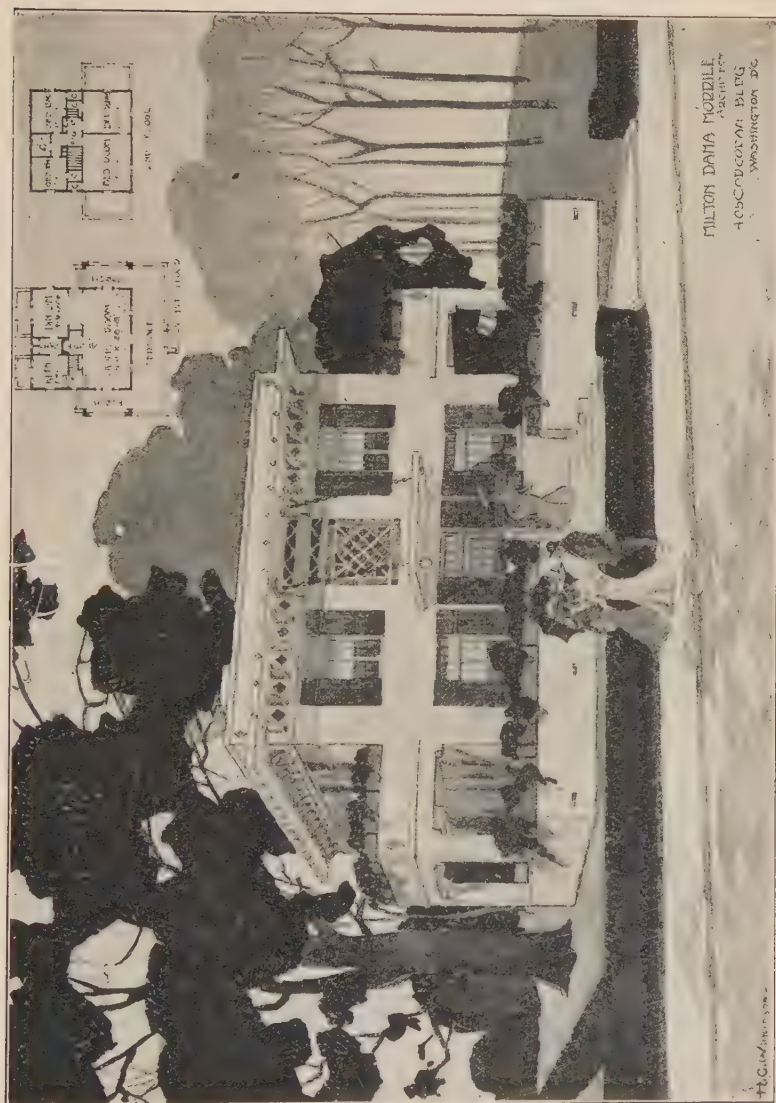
DESIGN FOR A SEVEN-ROOM CONCRETE HOUSE.
